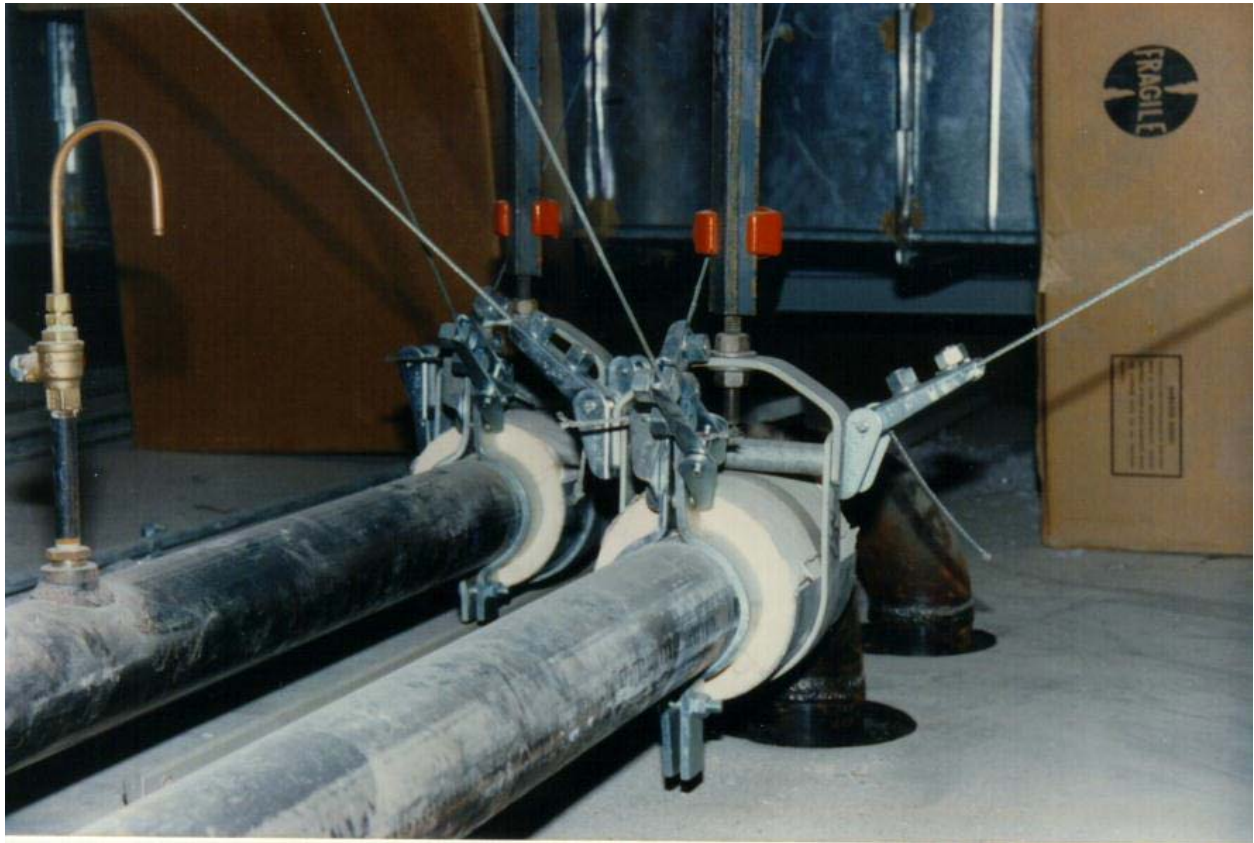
Floor penetration with oversized opening and vertical and lateral restraints immediately above floor (Photo courtesy of Mason Industries).
